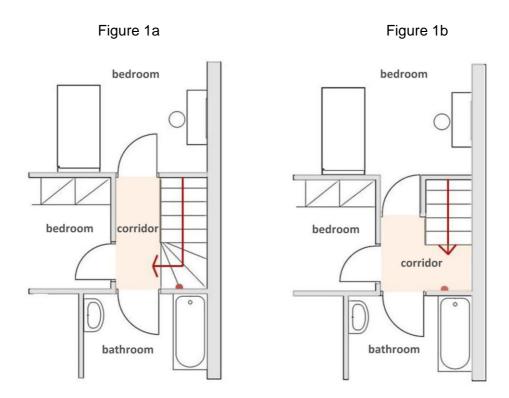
, b: Current social housing floorplan (1a) and hypothetical redesigned floorplan (1b)
